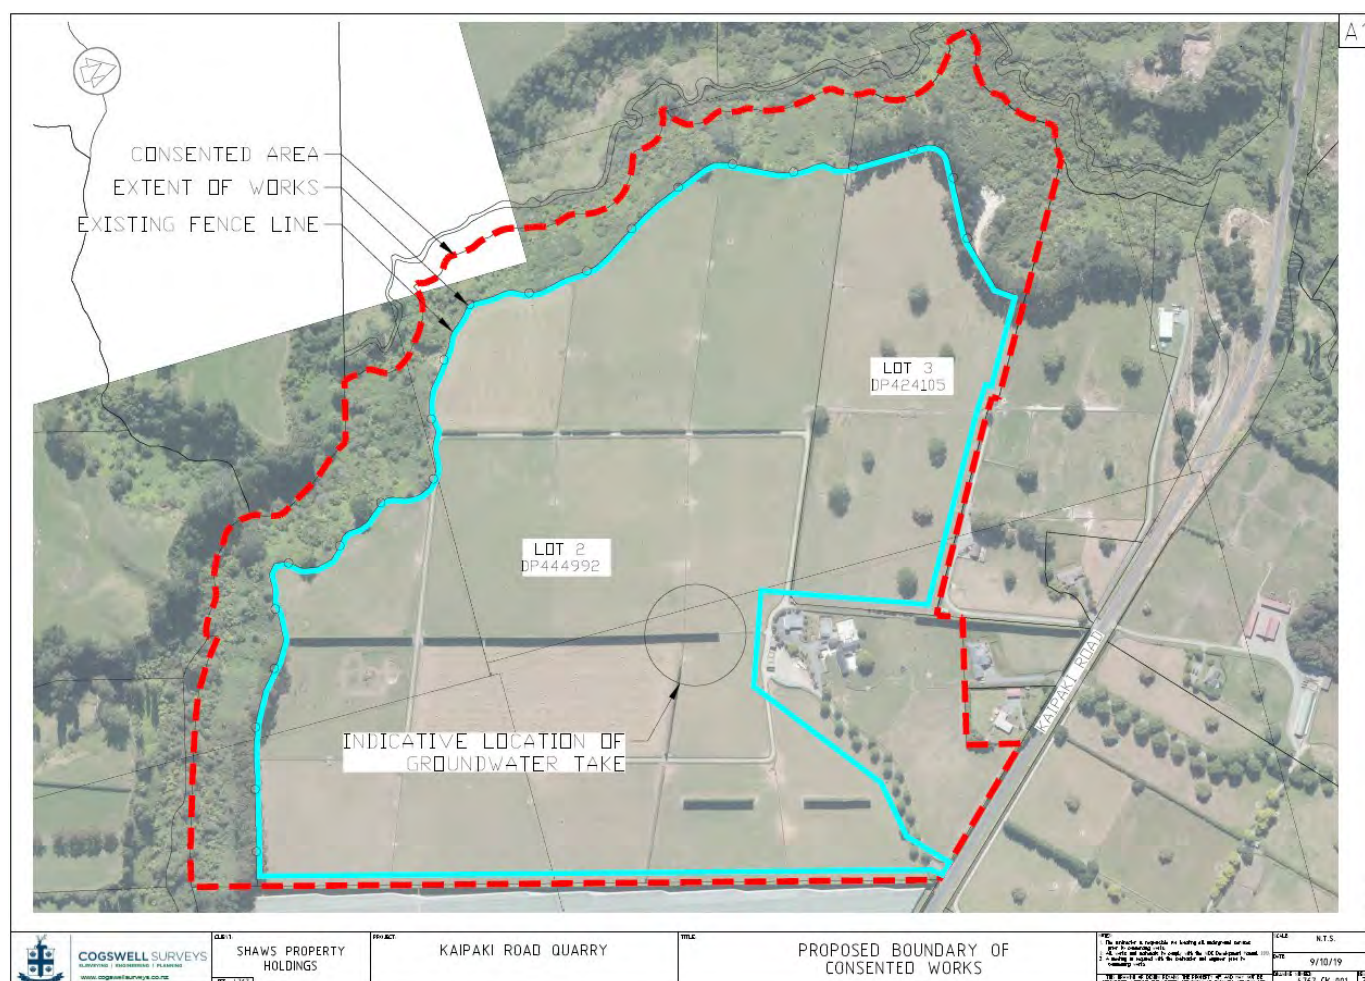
Quarry Site Plan – Extent of Works Boundary (light blue Line)
